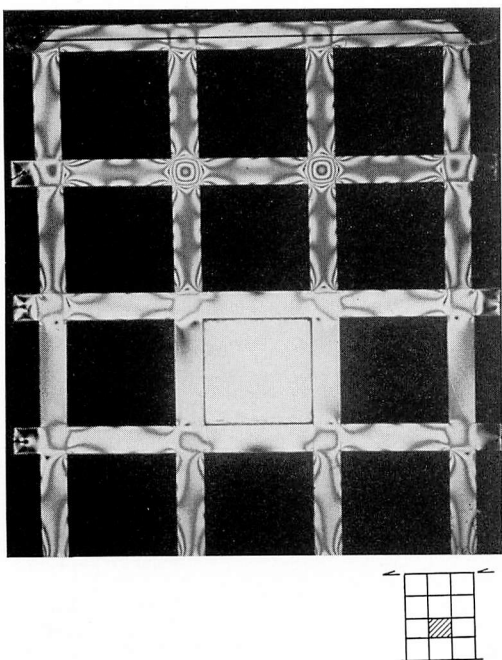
a Isochromatics of Frame with a Wall Panel Subjected to Lateral Forces on Roof Beams
